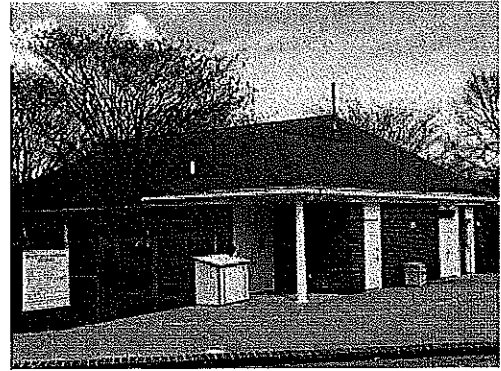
View of the clubhouse showing the doors, fascia trim, and dentil moulding.
